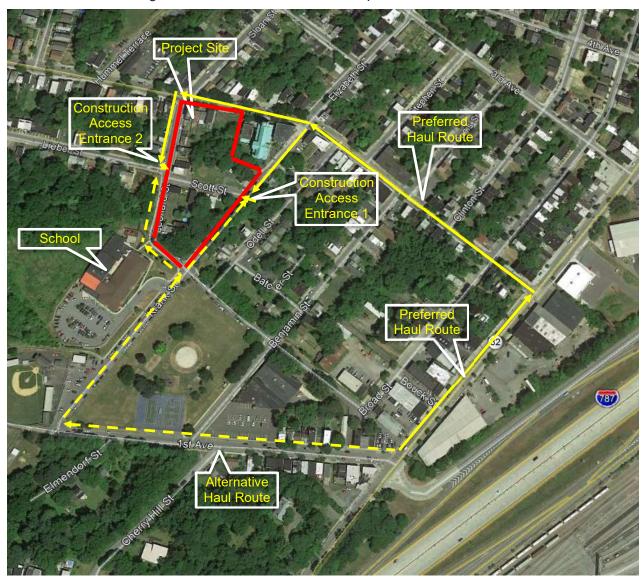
Construction Access and Haul Route (Source: Google Earth)
